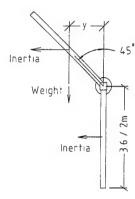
Weight and inertia loads on 'U' channel welds
